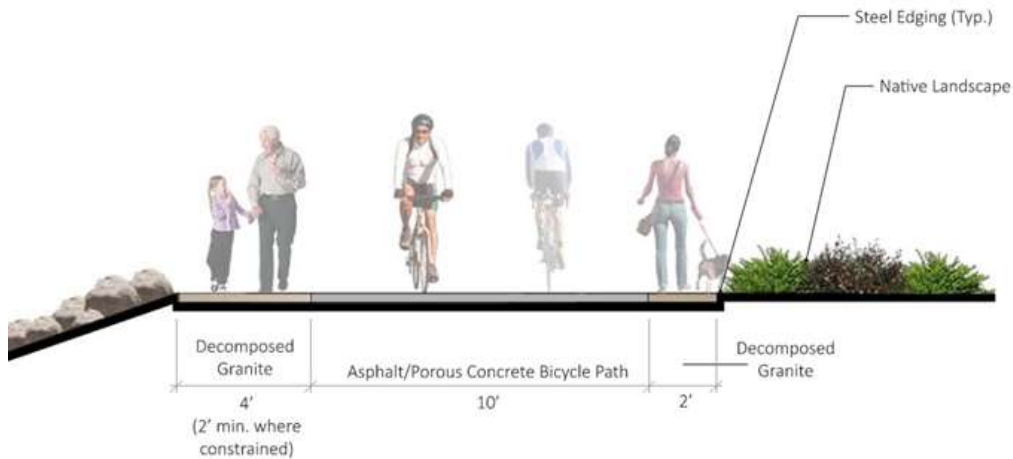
San Diego River Trail Enhancement Plan Proposed Section
